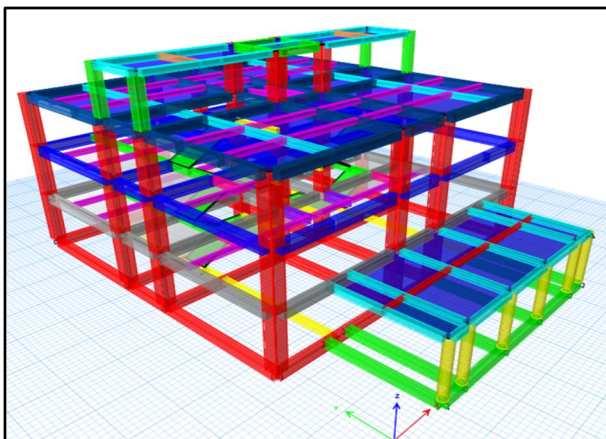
3D structural model of laboratory building zone C (model 2)
